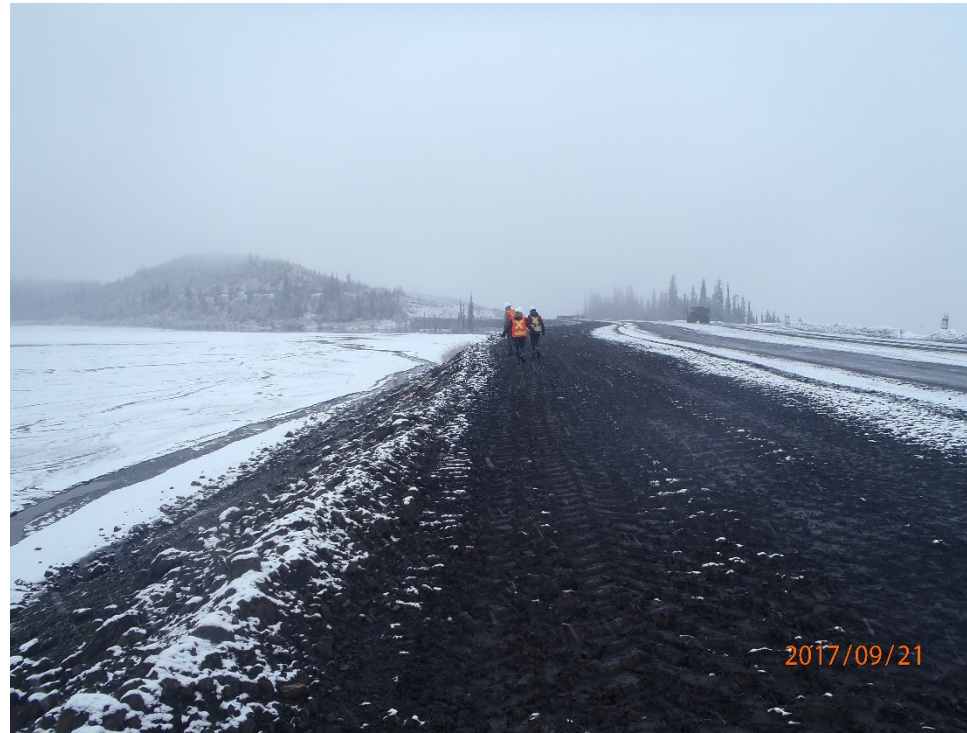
West Dam – downstream slope under construction, looking north. 21 September 2017.
